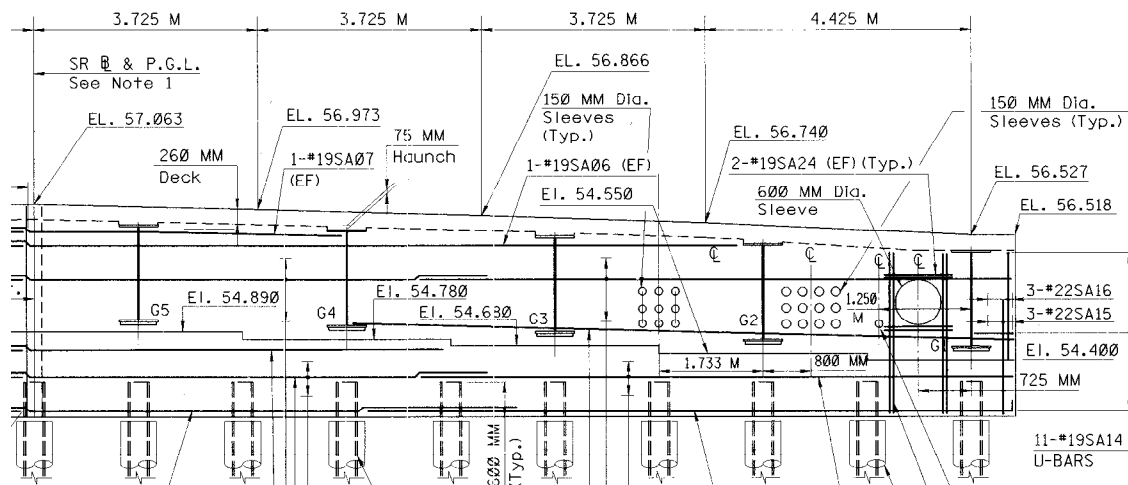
Scotch Road Bridge – Girders, Abutment and Piles (Courtesy of NJDOT)
